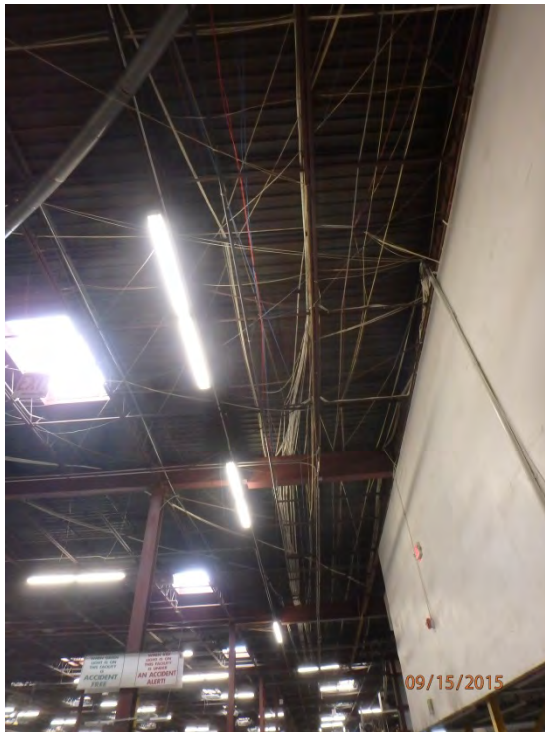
View of ceiling of cabling near southwest corner of main warehouse.
